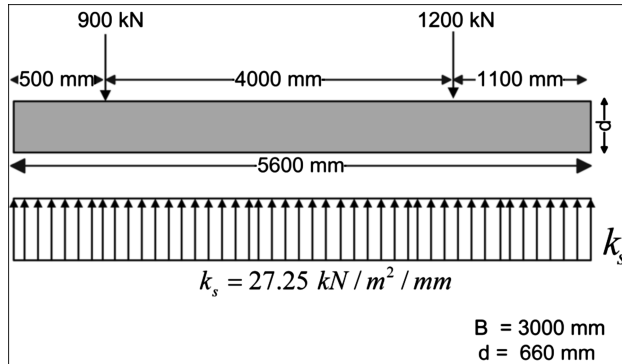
C.11 Details of loading and modulus of the subgrade reaction of a beam resting on an elastic foundation (Example 12.4).
